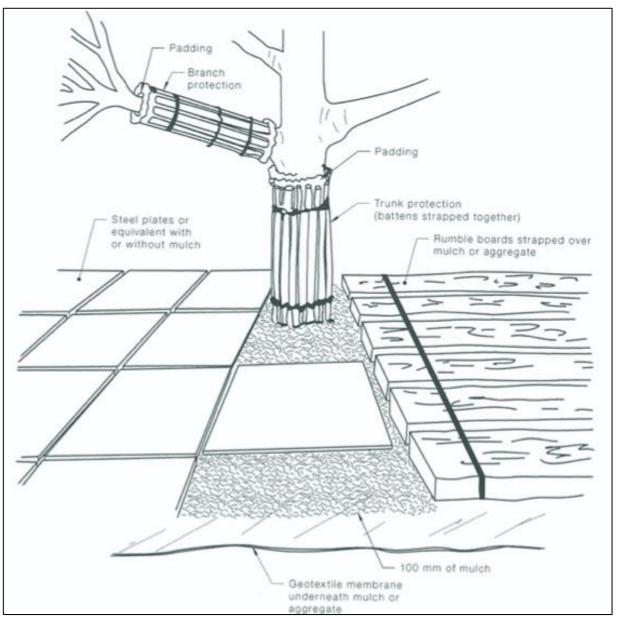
Stem and ground protection measures specified in Section 4.5.3 of *AS4970 (2009)* for temporary access within a fenced protection zone. Steel plates or rumble boards are shown to be suitable for ground protection over mulch and geotextile fabric.
